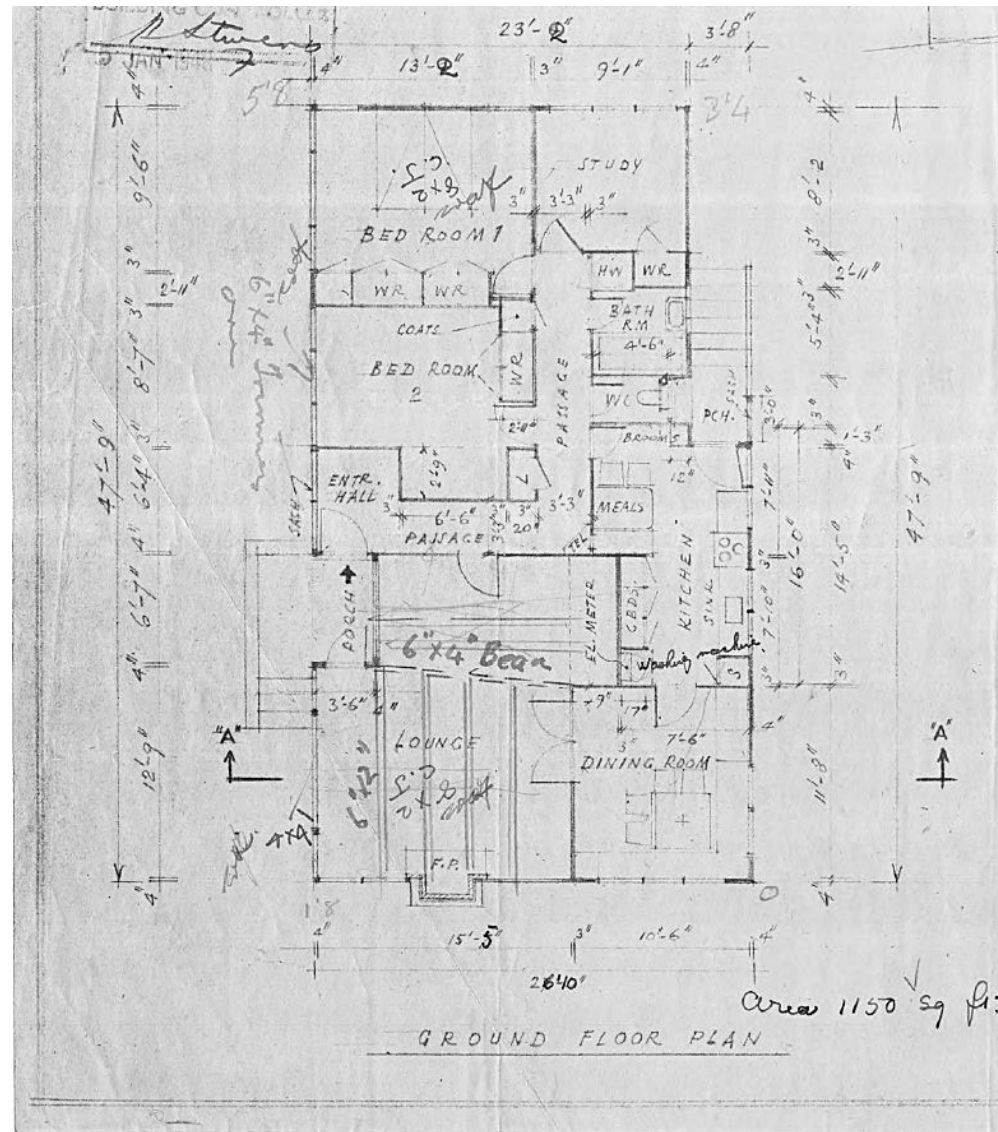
Halberstam House plans, Wellington City Council Archives, 00056-B26573
